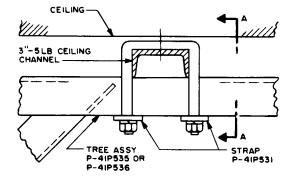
Typical Assembly for Back-to-Back Lineup of Duct-Type Frames (A&M Only)
